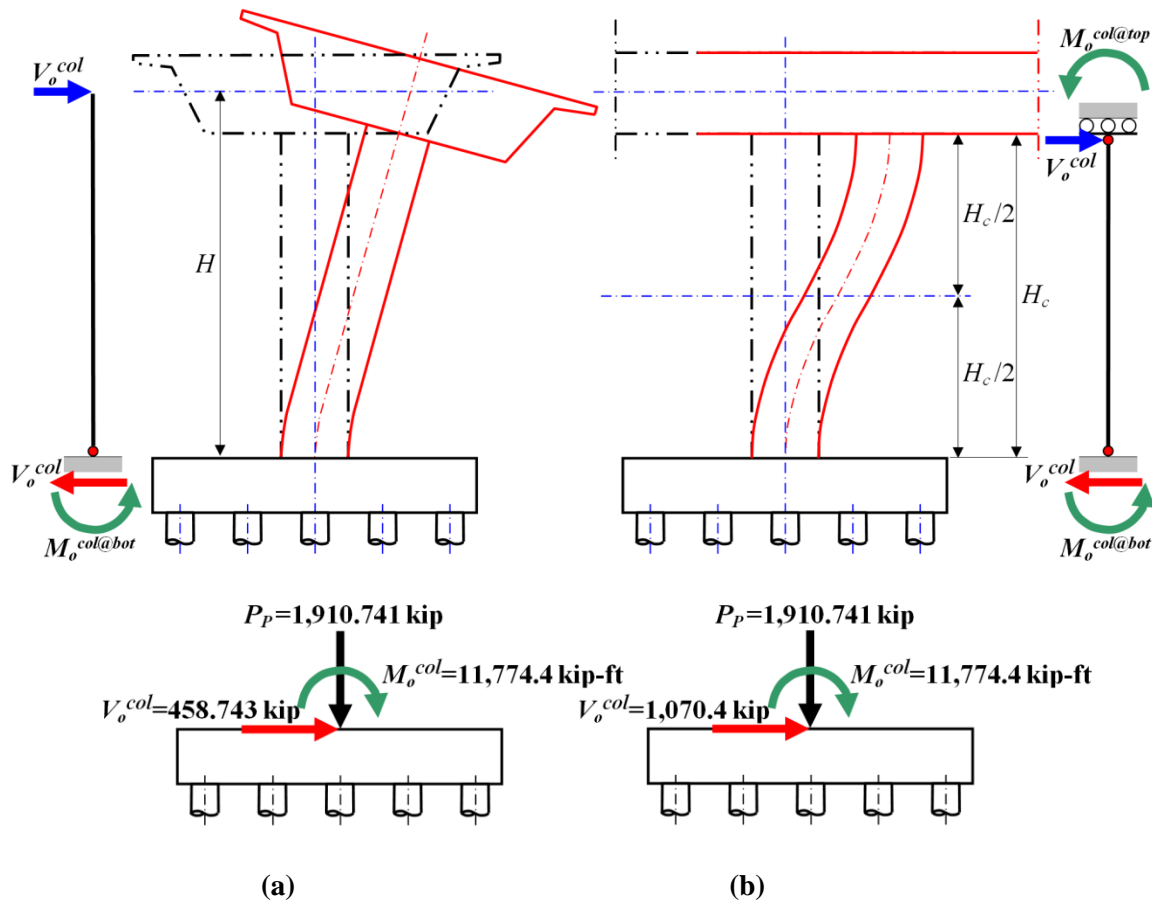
Schematic Views of the Deformed Shape of Pier 3
